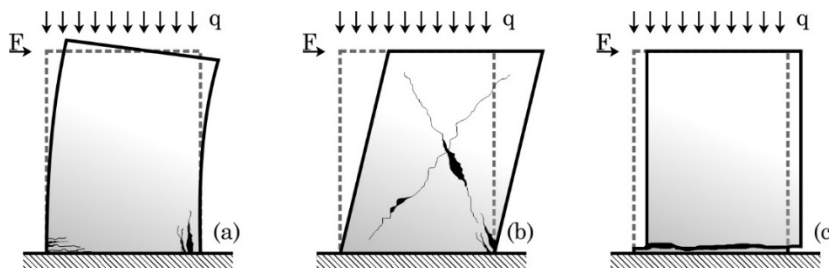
Main in-plane failure mechanisms of a masonry portion (a) flexural failure; (b) shear-diagonal failure; and (c) shear sliding failure.
